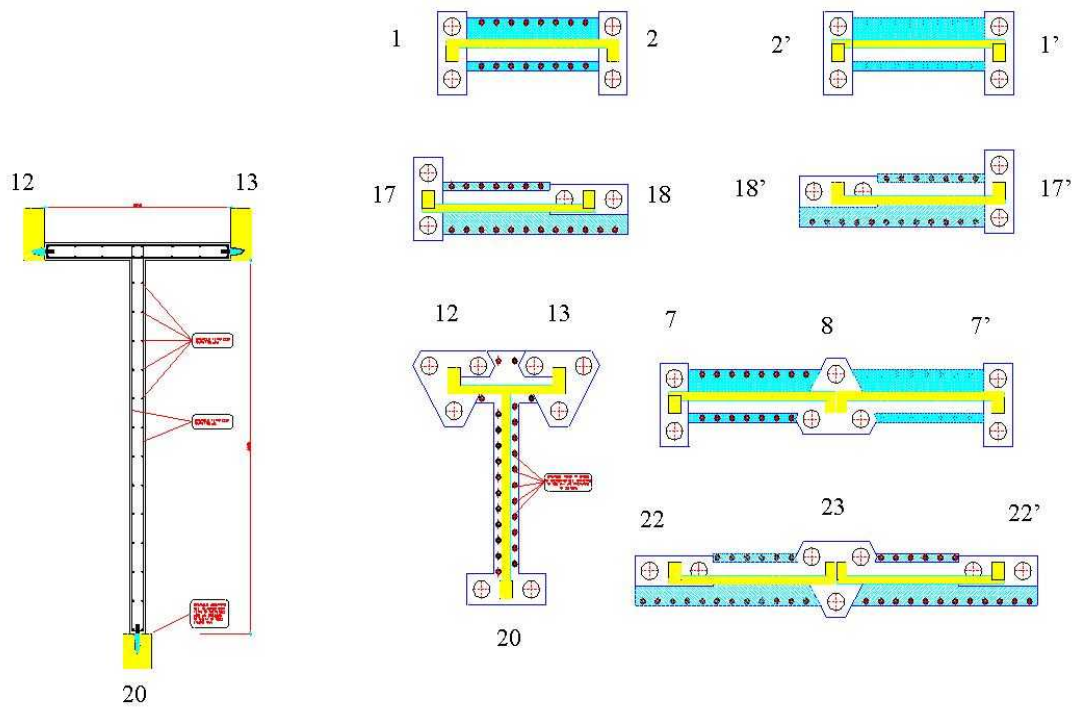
E: Seismic Strengthening- Foundation and Wall Details
